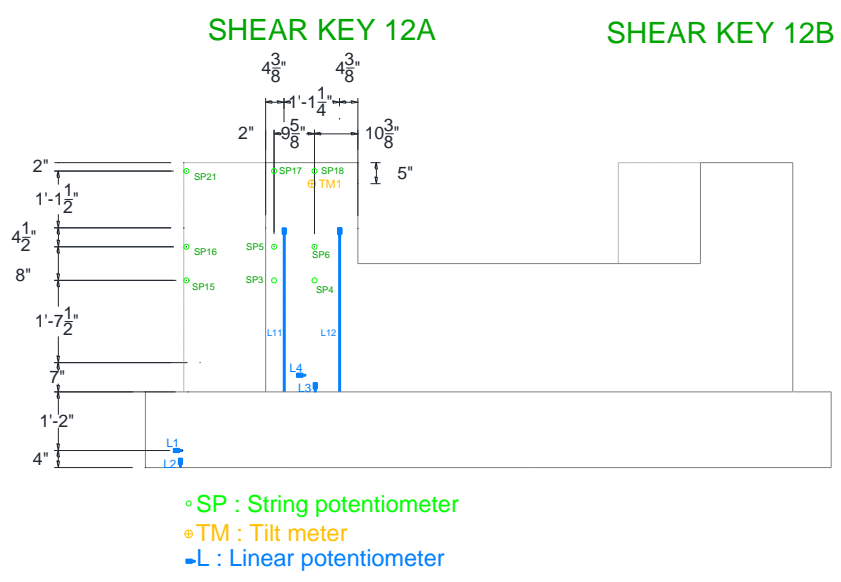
External instrumentation located on the northwest side of Specimen 12
